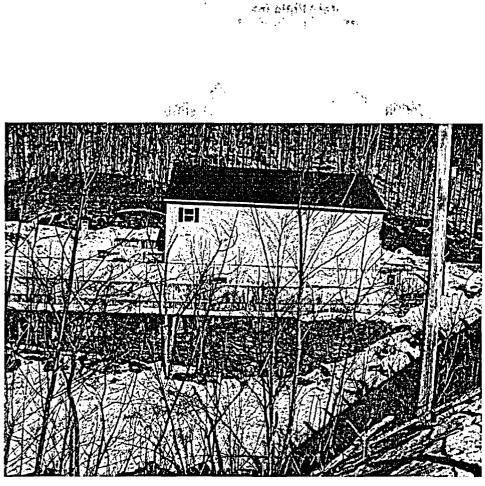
Owner's structure adjacent to retaining wall, two blocks visible at left of structure
